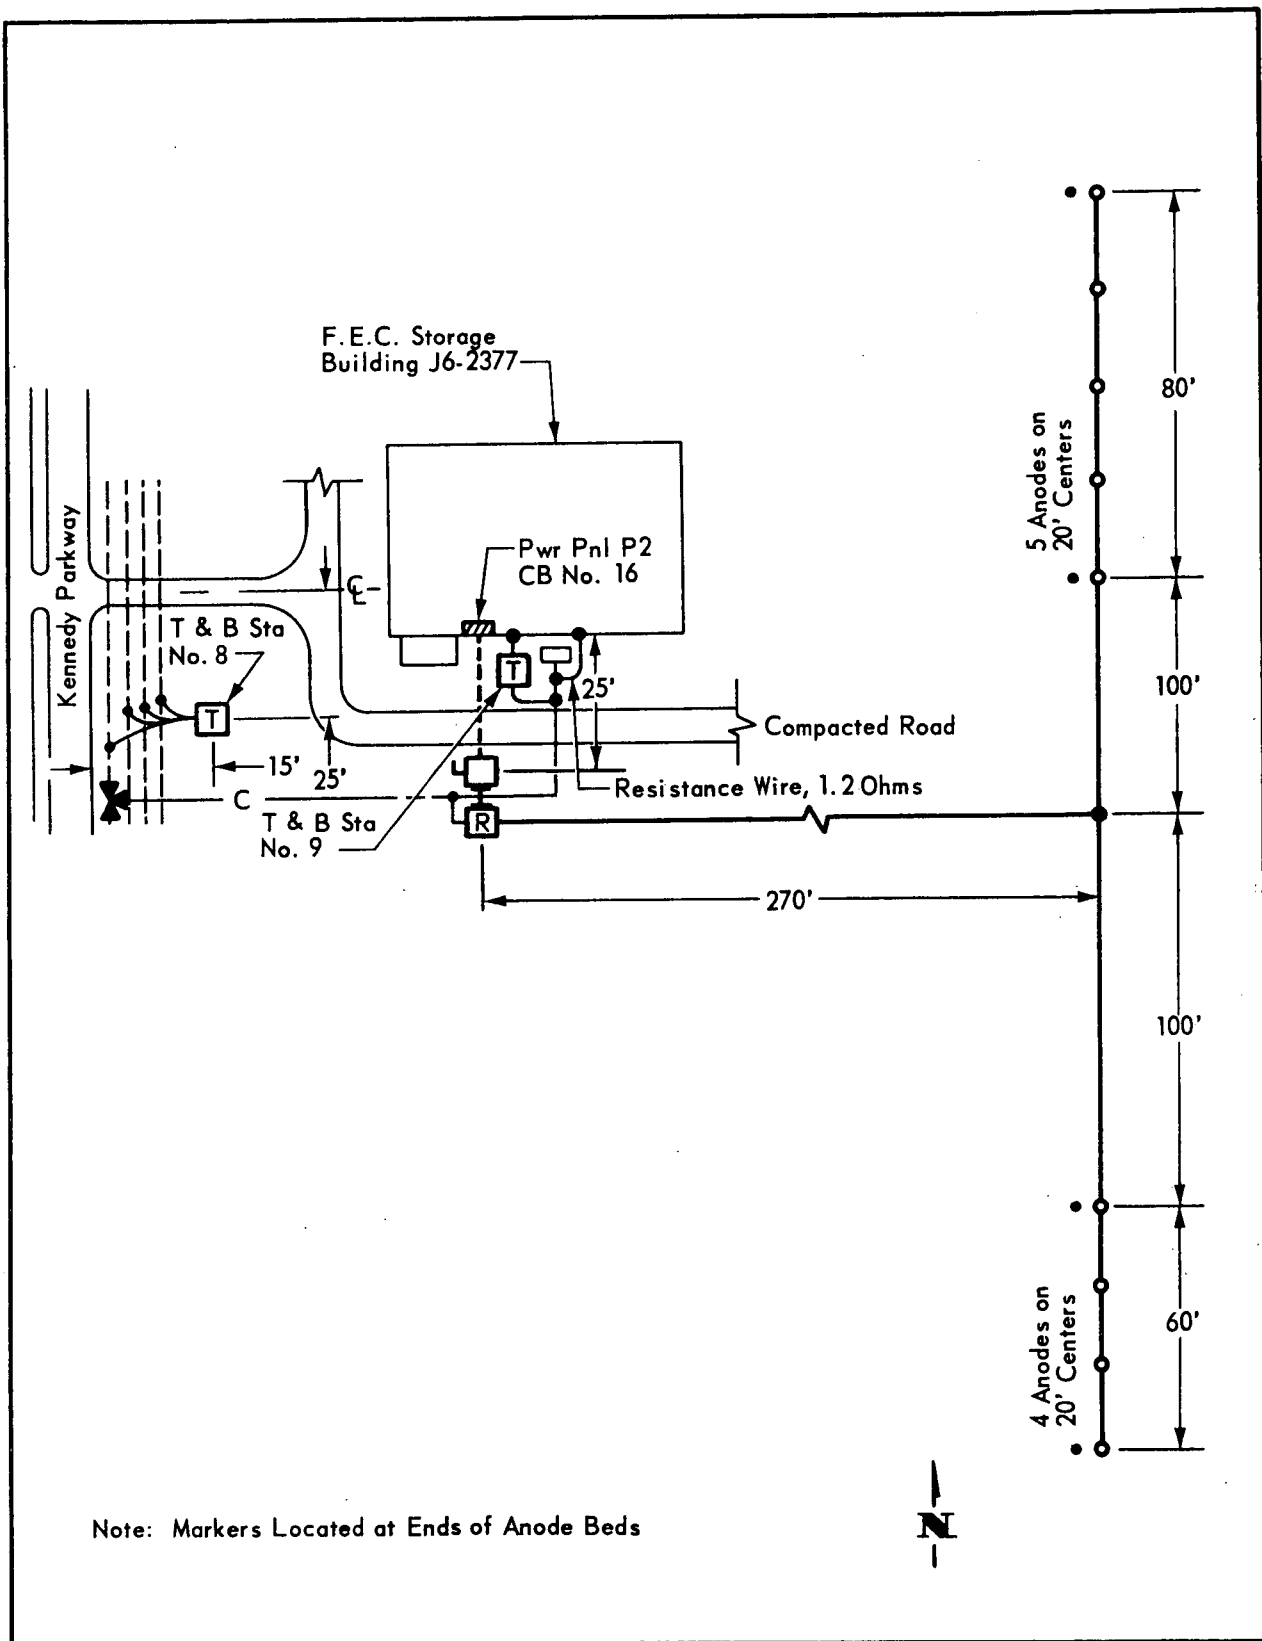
Site No. 2 and Test and Bond Station Nos. 8 and 9
